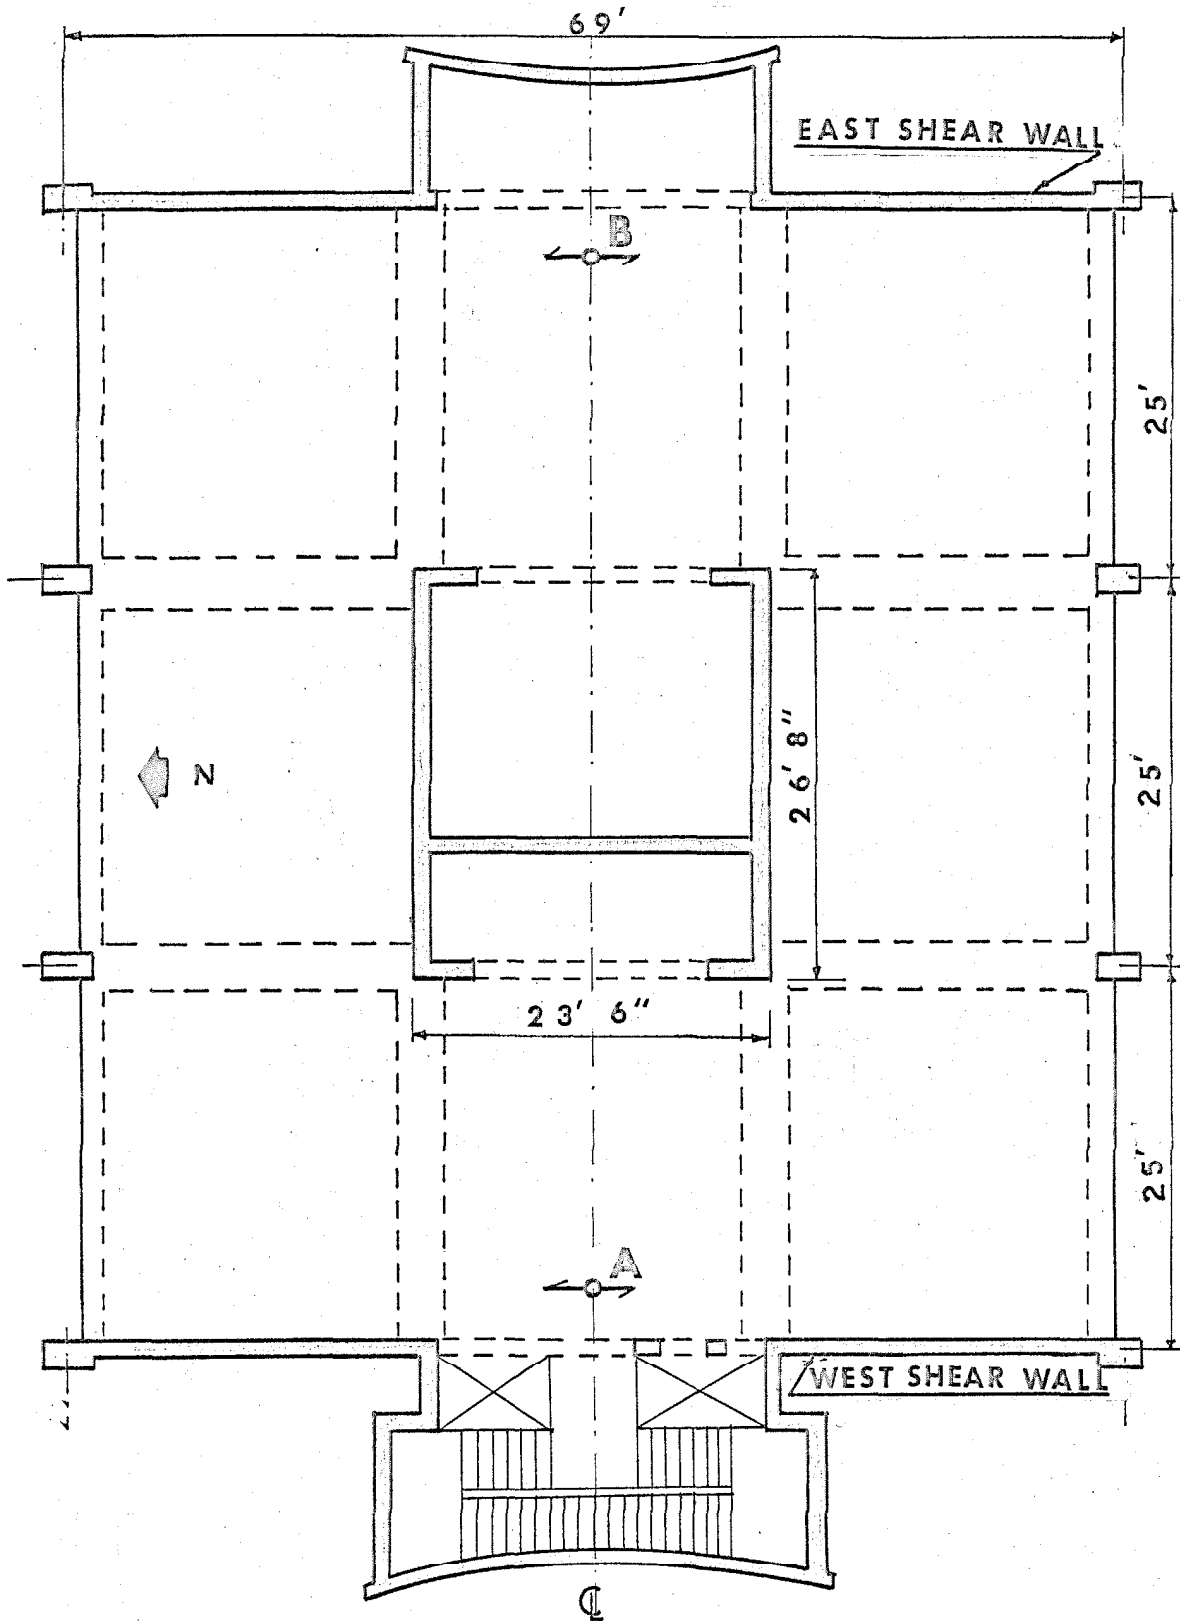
TYPICAL FLOOR PLAN SHOWING LOCATION OF THE VIBRATION GENERATORS
